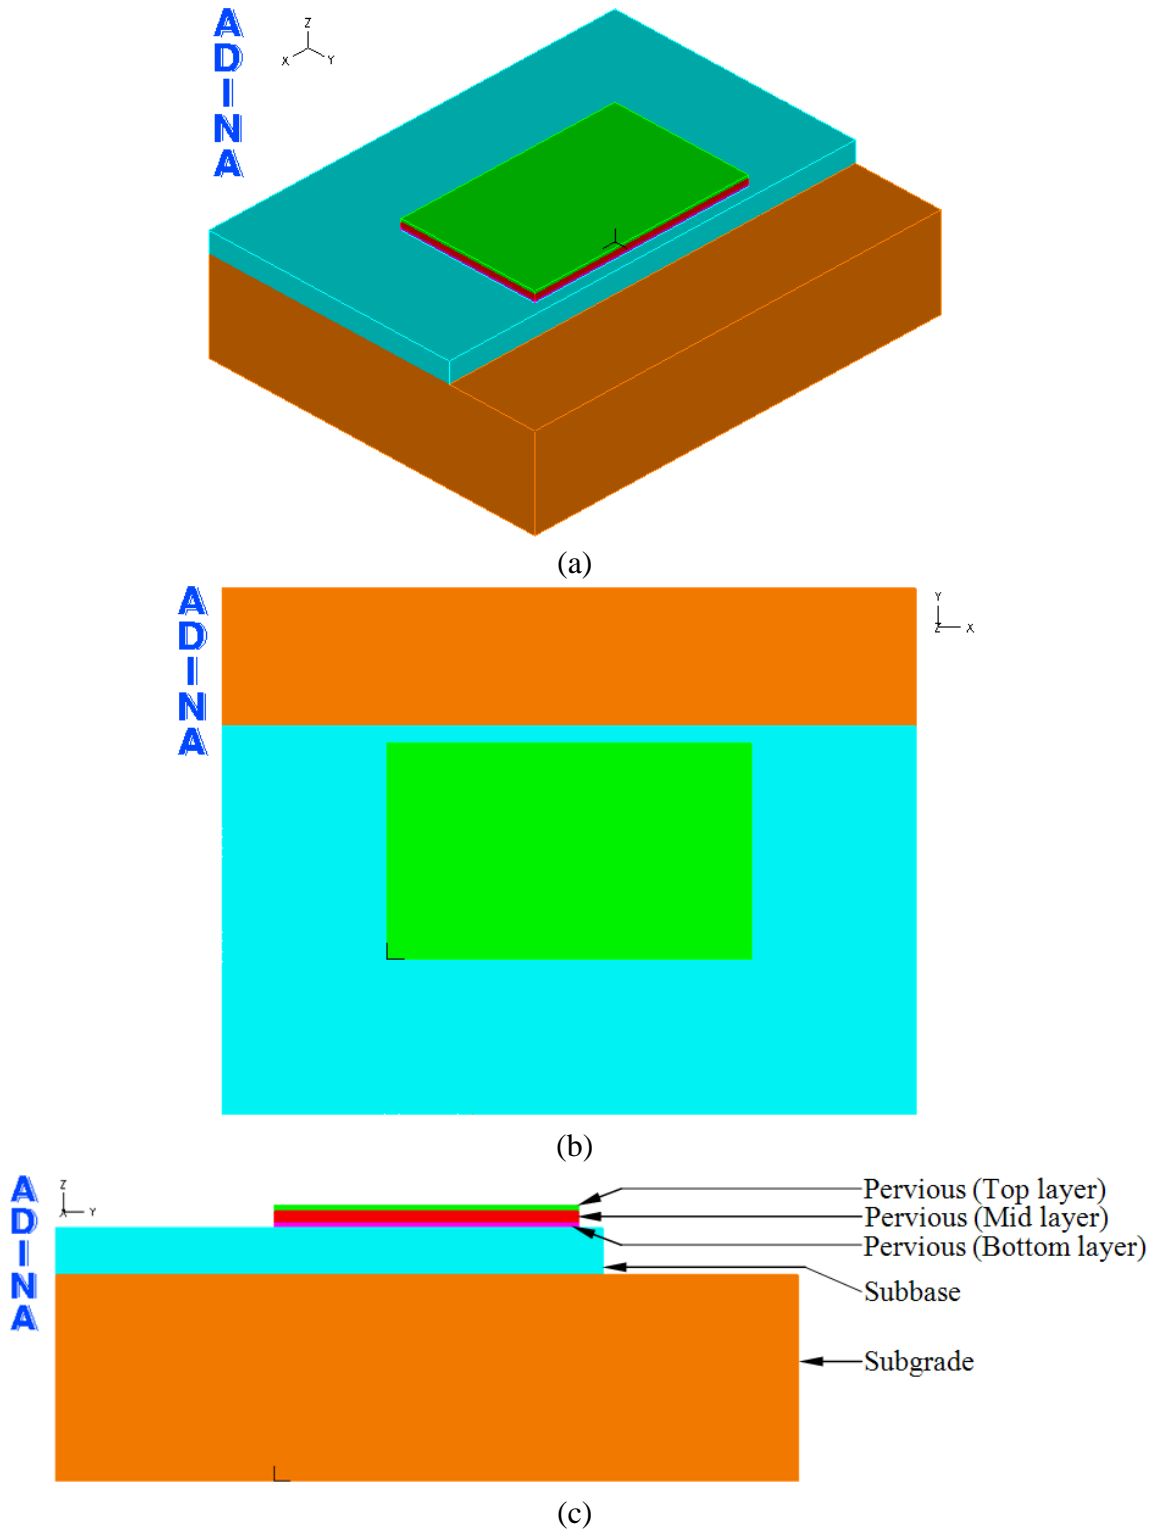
Pavement model subdivision by depth used in the ADINA model (a) 3-D view, (b) Plan view of the pavement (x-y plane) and (c) Elevation of the pavement (y-z plane)
